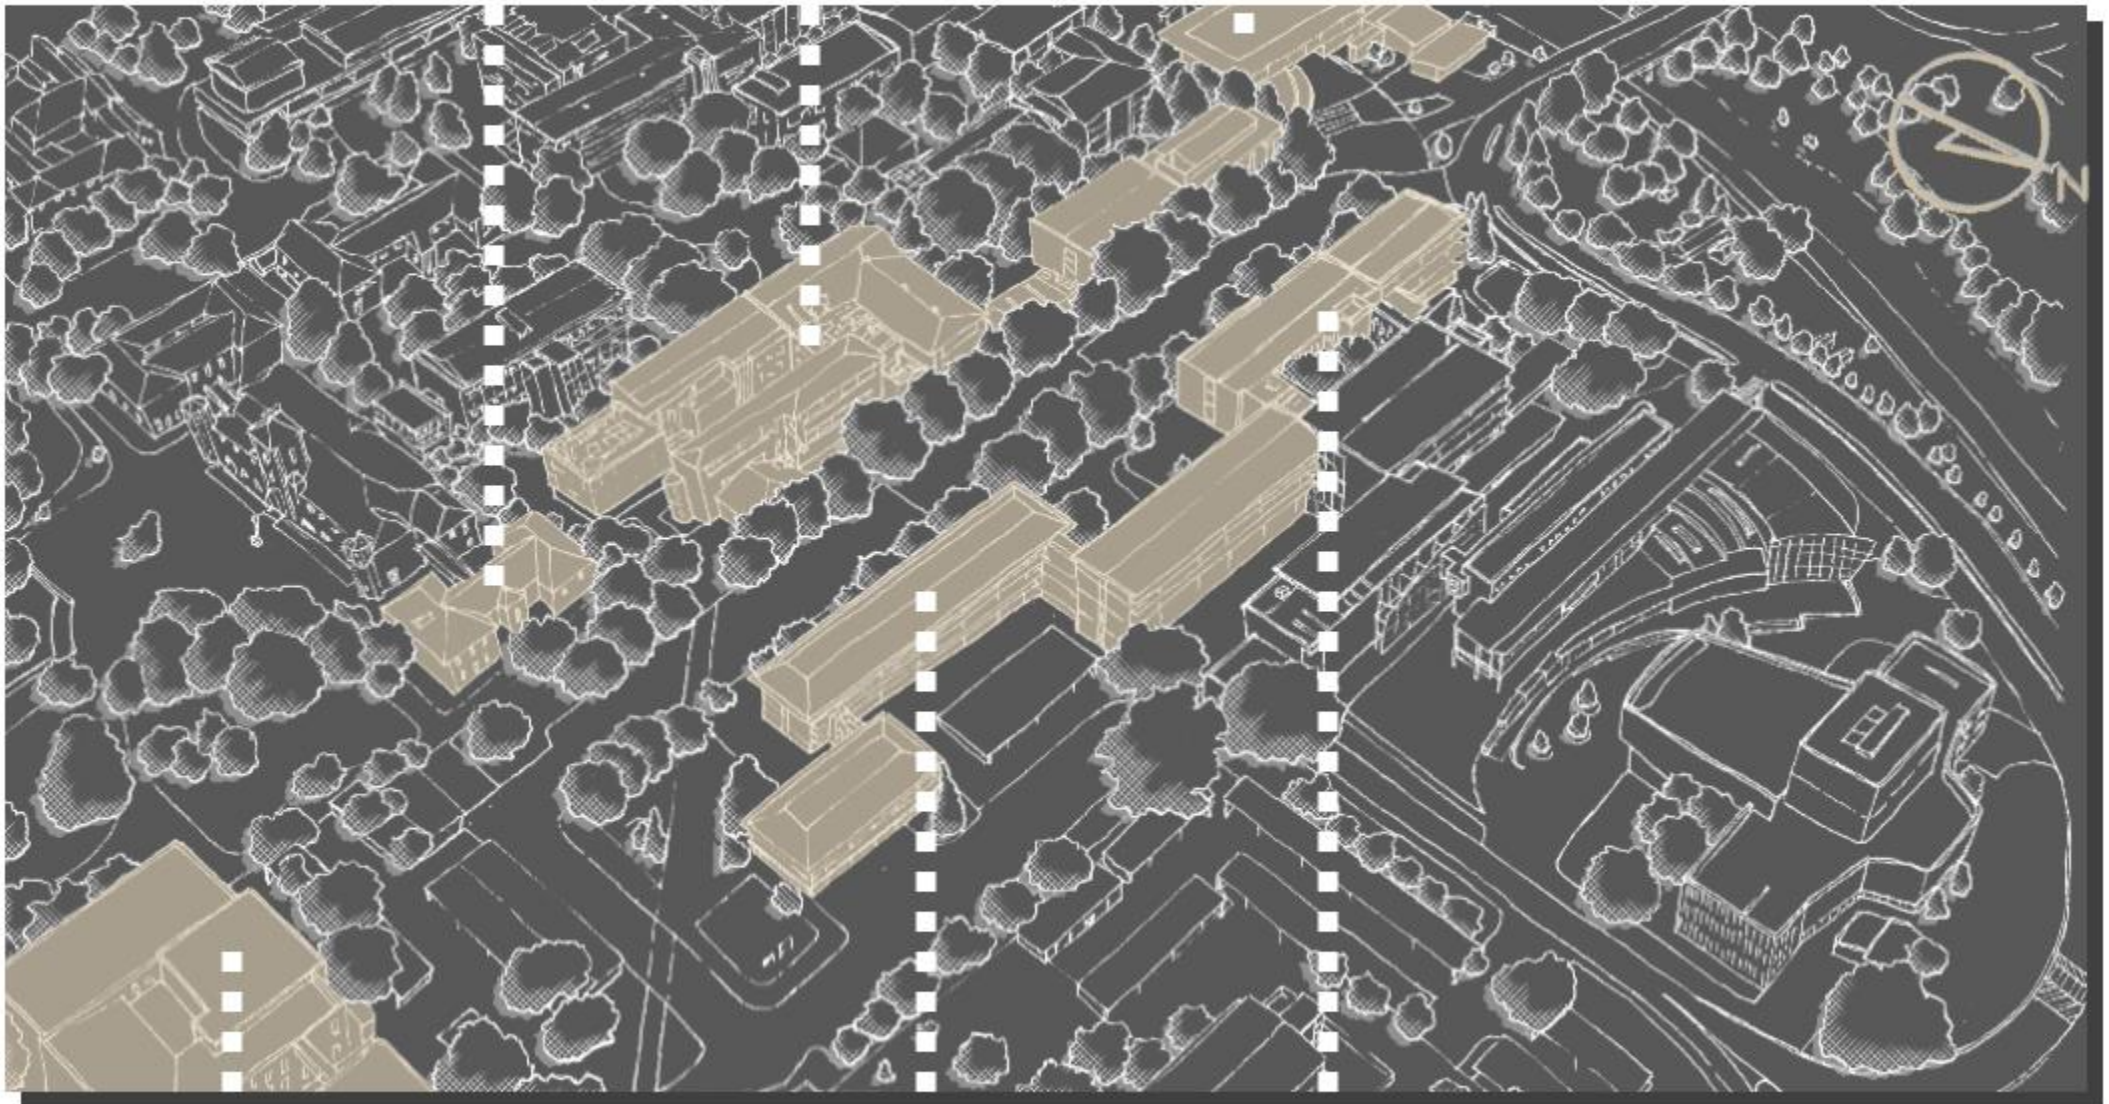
Illustration of Proposed Site and Surrounding Buildings
